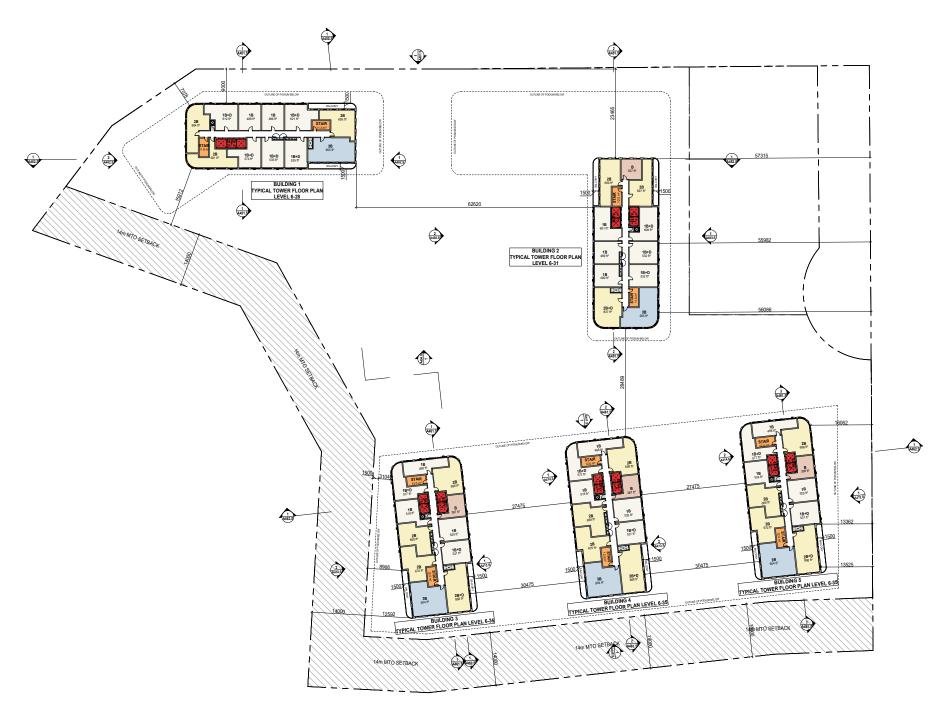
TYPICAL TOWER FLOORPLATE PLAN - FLOORS 6-35 (BDP. QUADRANGLE ARCHITECTS LTD.)
